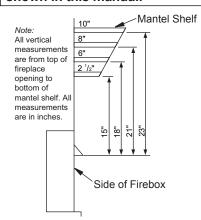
Minimum Mantel Clearances for Built-In Installation
